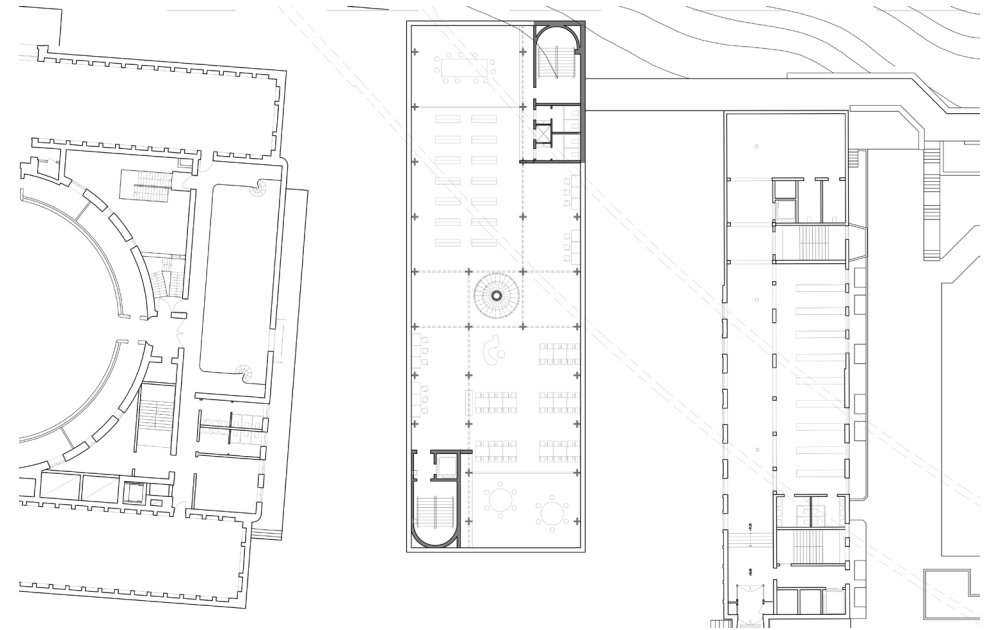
Ground floor plan of the decentralize proposal. Made by author.
